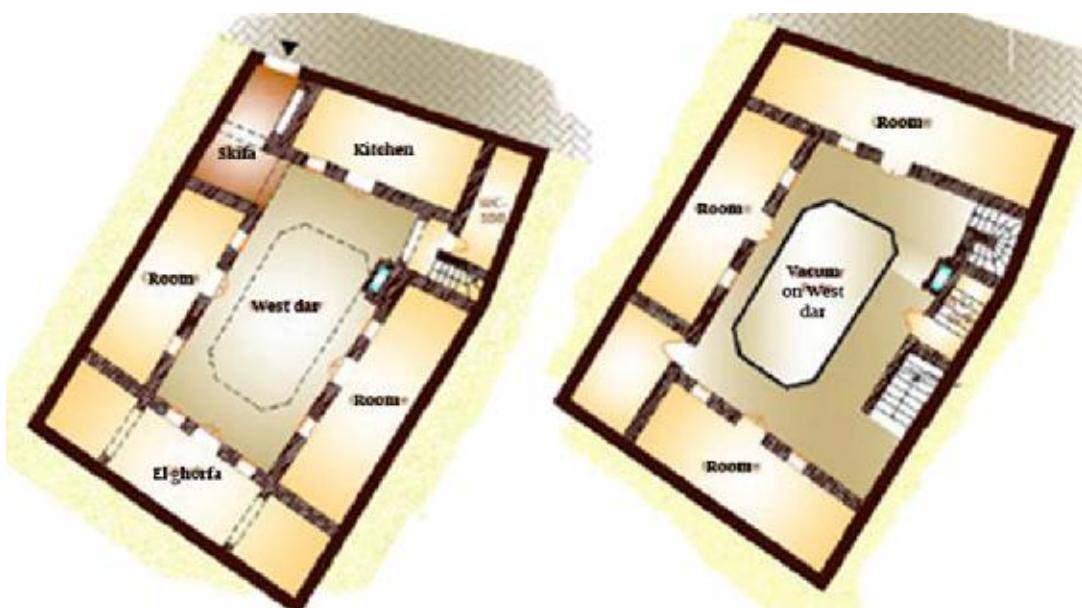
Plan of the DRC and 1st floor of Dar Hssayen of the medina of Tlemcen.
